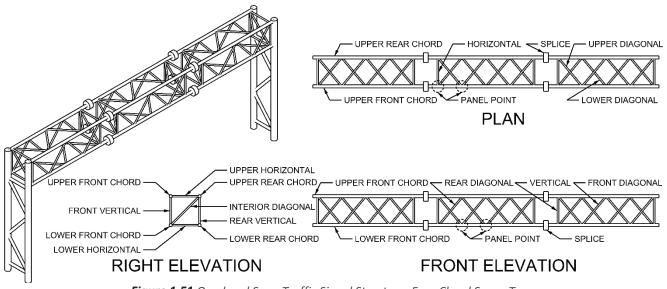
Overhead Span Traffic Signal Structure, Four Chord Space Truss
